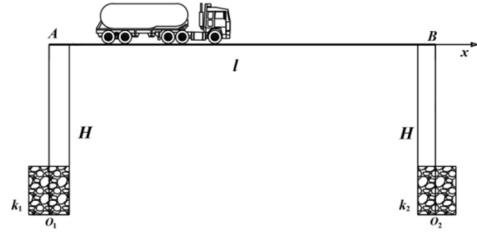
Calculation diagram of a road single-span beam bridge with moving loads
